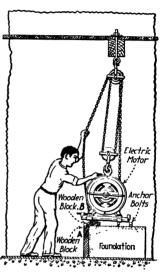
Method of lifting a motor with a chain block onto a foundation which has anchor bolts projecting above its top. Block, B prevents motor base from sliding into fartherest anchor bolt. (Second step.)
